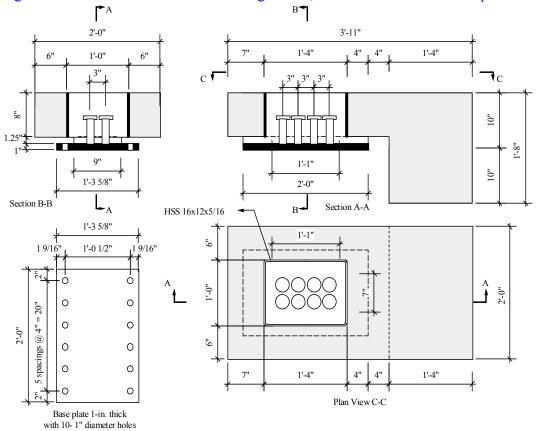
Concrete Dimensions of the eight-stud, steel-tube confinement specimen
